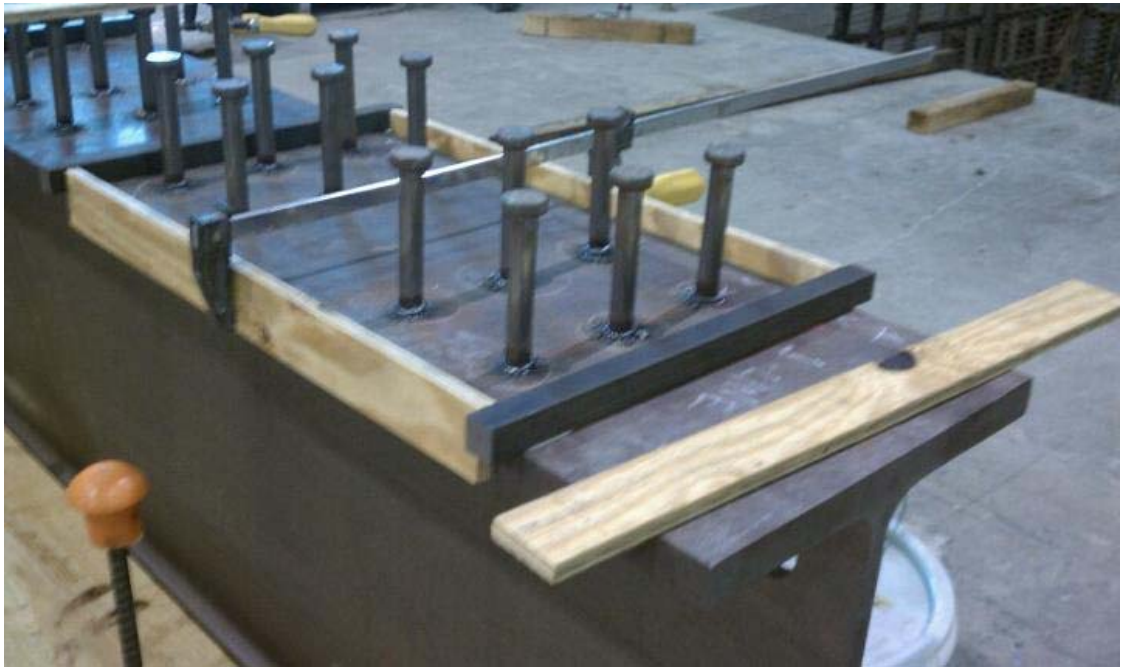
Forming of the Bridge Haunch Prior to Panel Arrival
